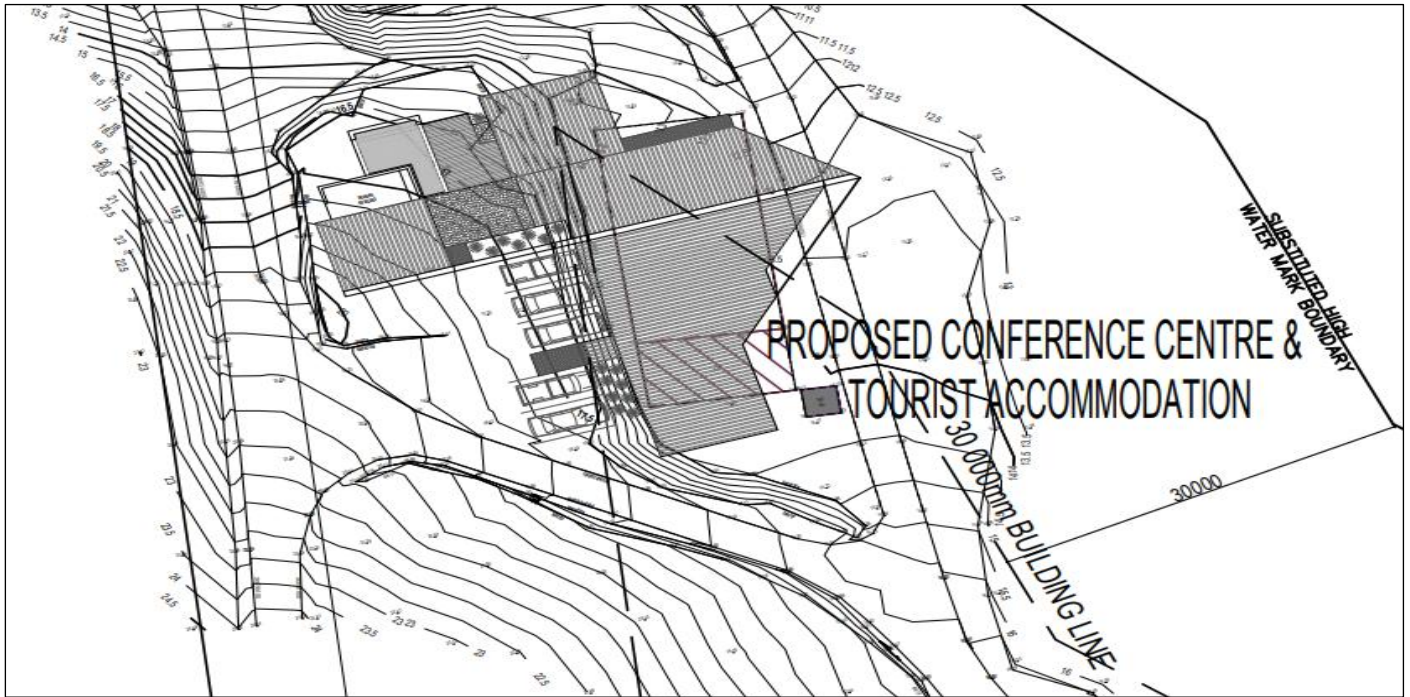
Proposed Conference Centre and Tourist Facilities (TMBA, 2023)
